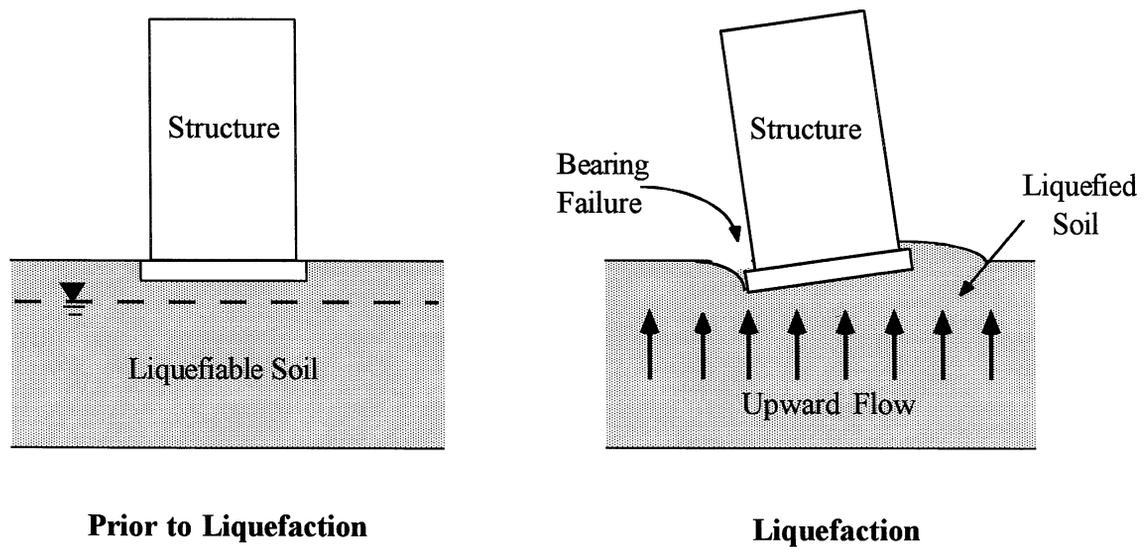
Bearing Capacity Failure (after Youd, 1984)
